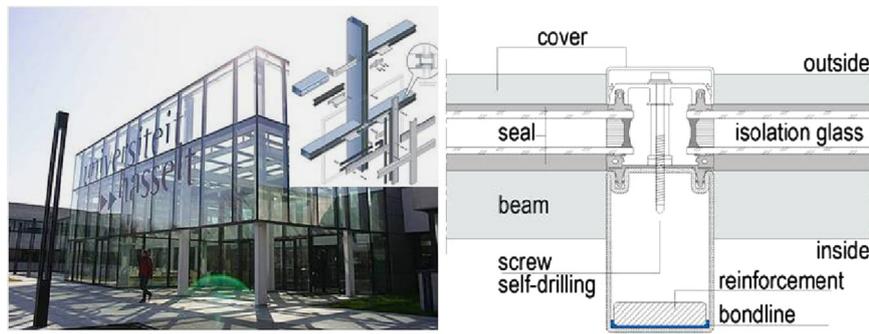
Left: post and beam façade; Right: bonded façade reinforcement.
